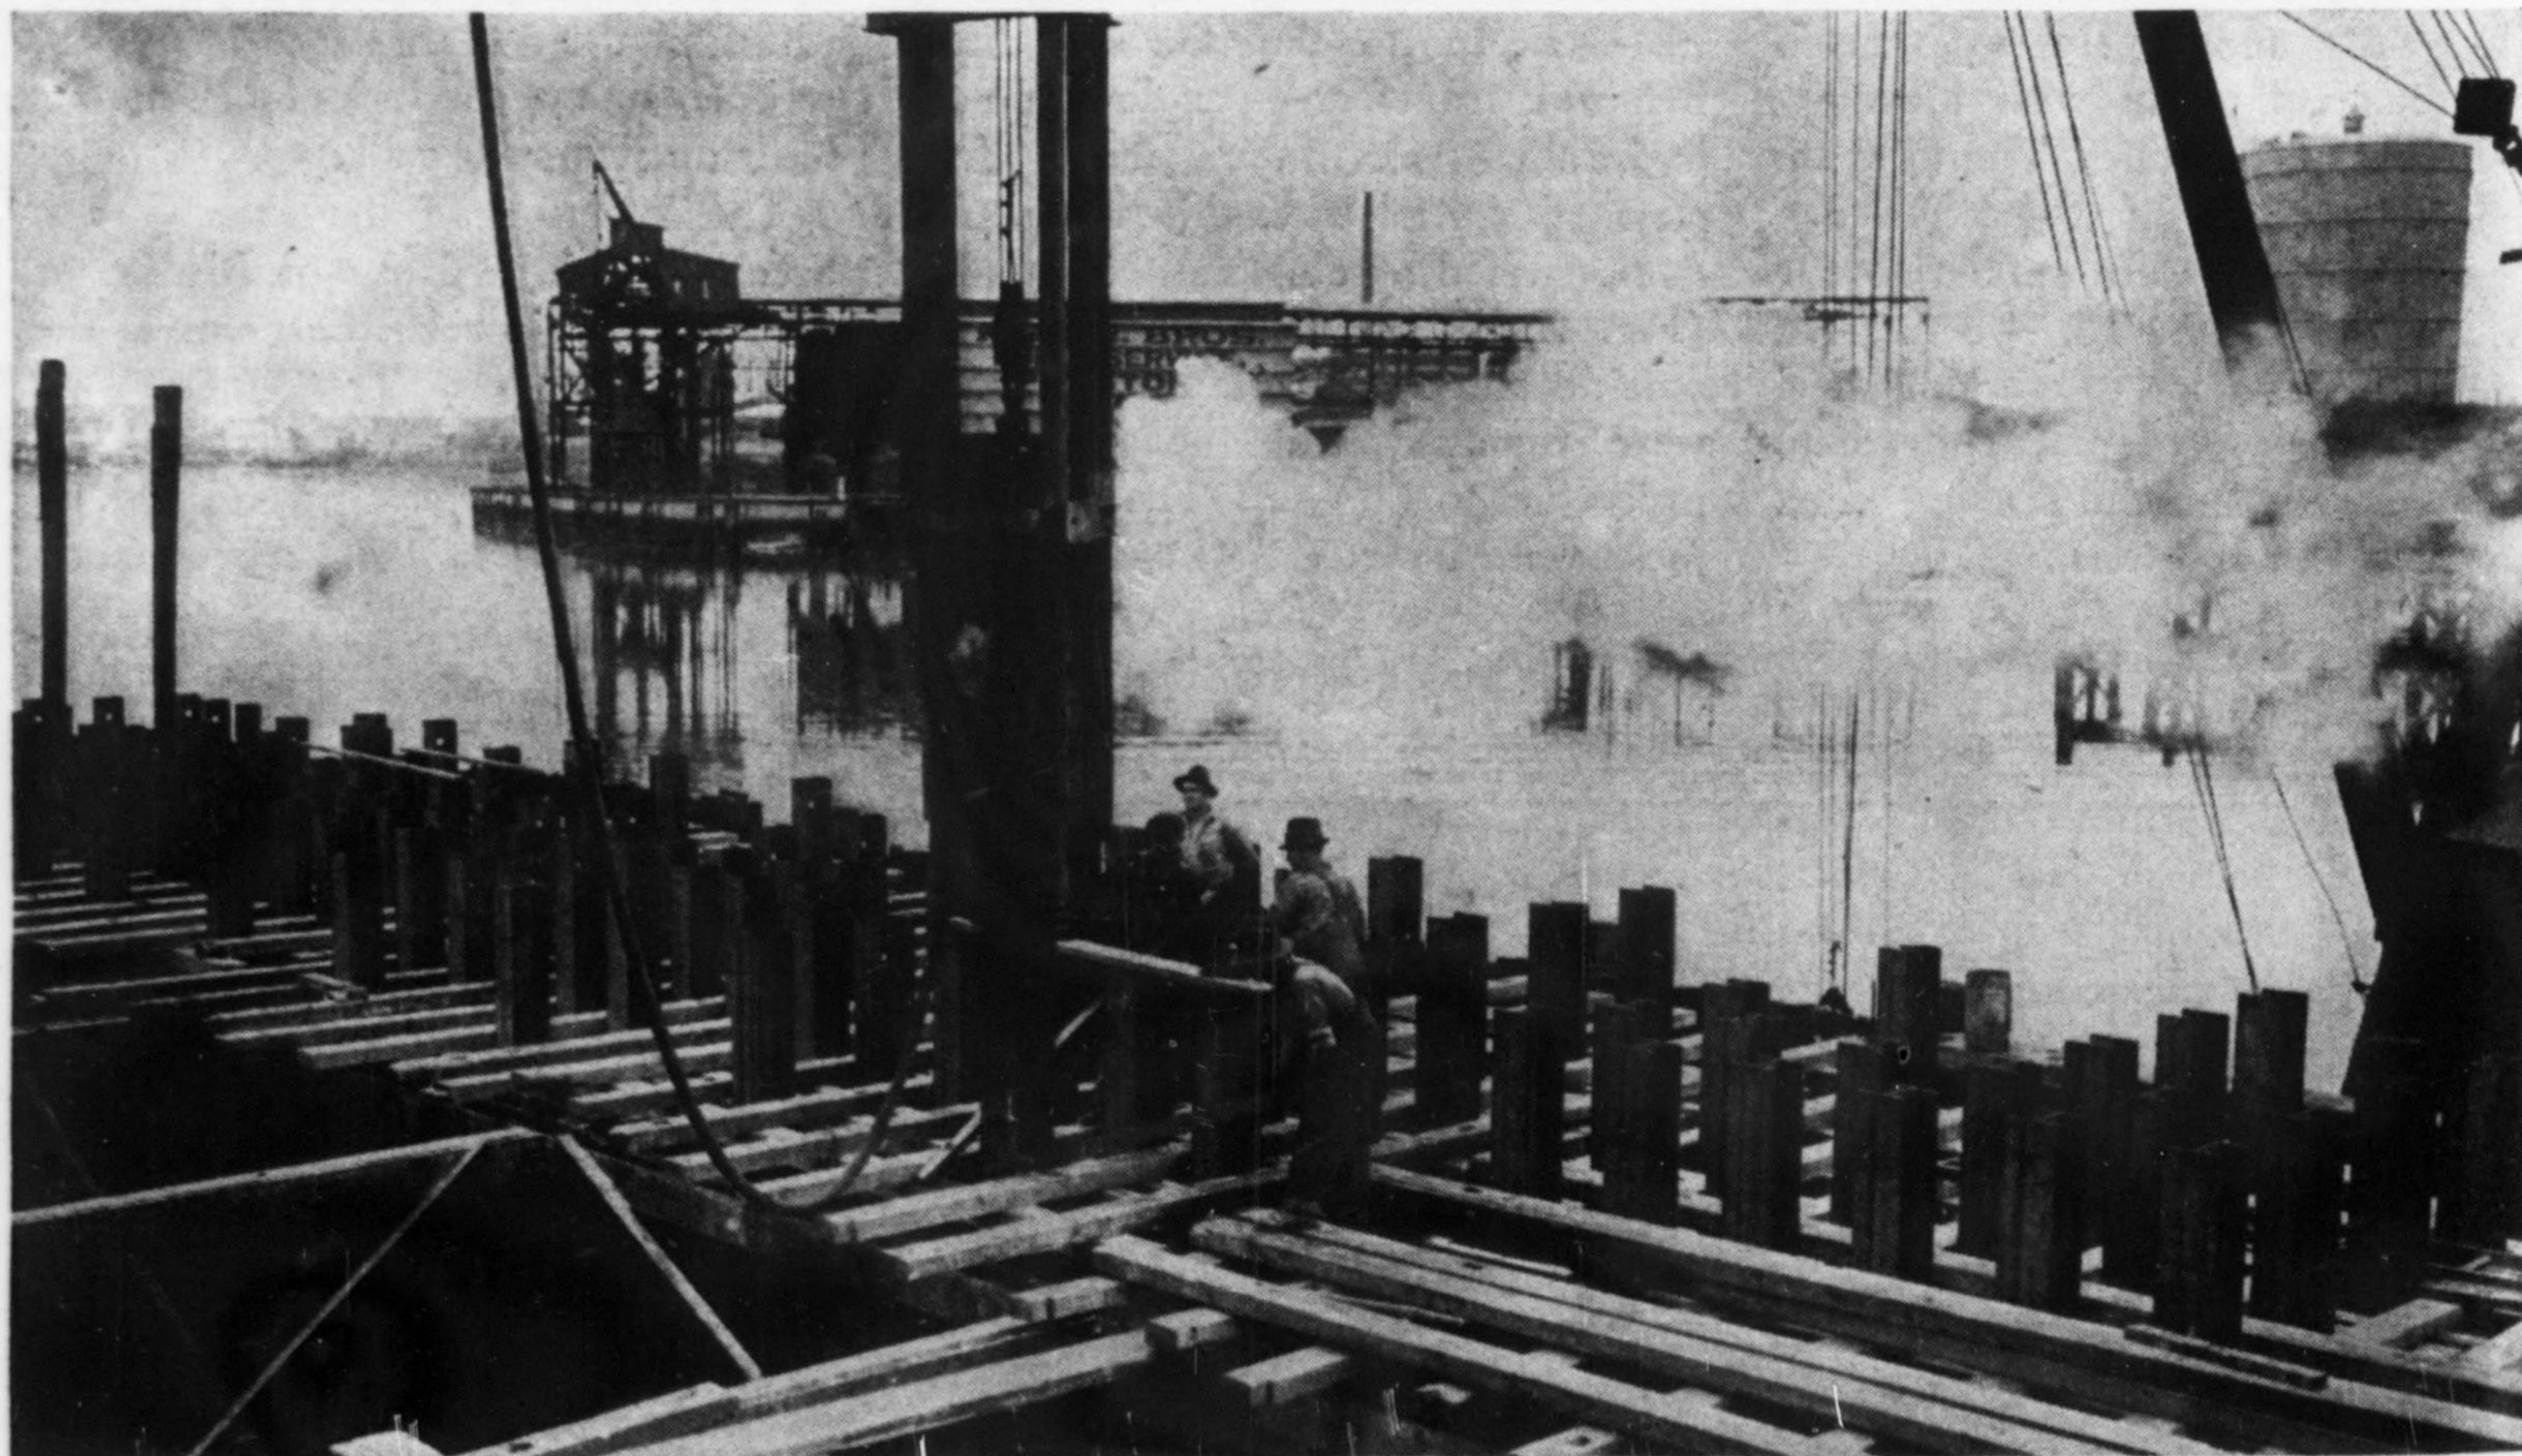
Driving 549 steel H-beam piles 55 and 65 ft. long in the Queens pier cofferdam was a high spot in the substructure construction for the Newtown Creek bridge.
